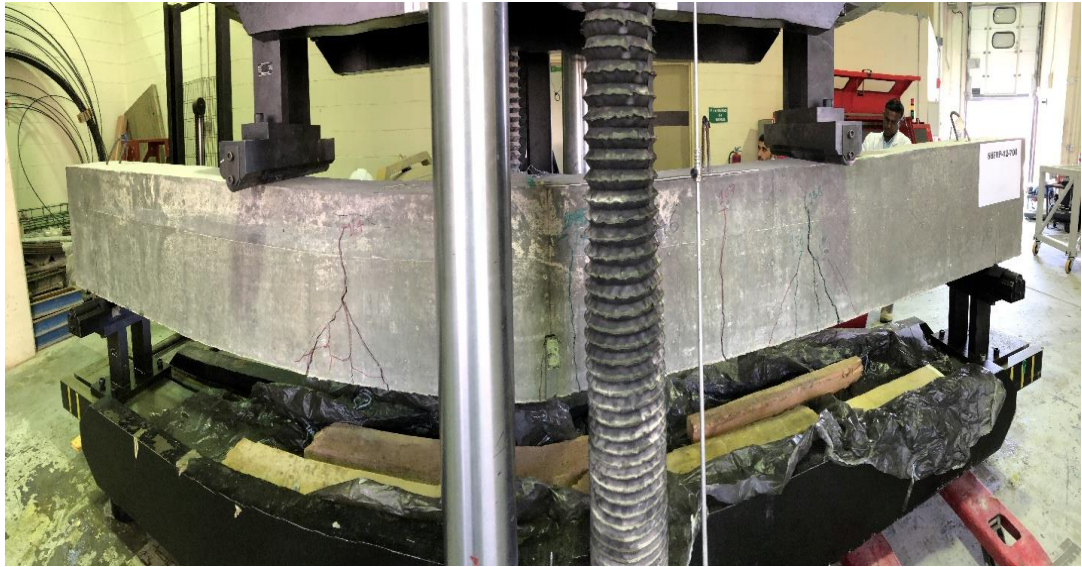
Cracking pattern of beam 5 (SBFRP-12-700)
